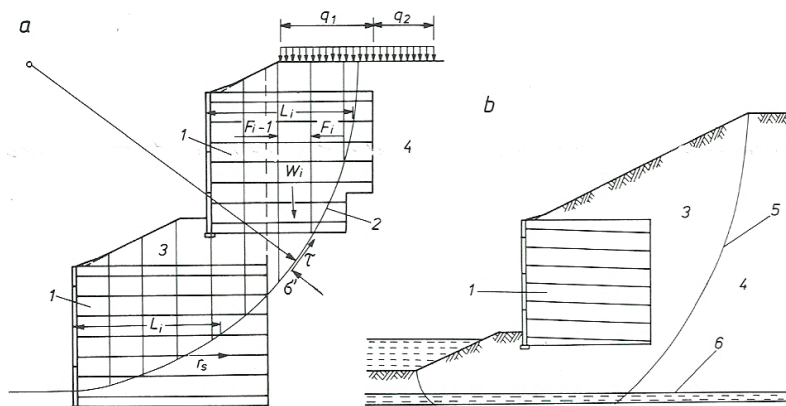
General stability control diagrams: *a* – destruction along the cylindrical surface, *b* – extraordinary massif damage case with a weak layer in the substrate, 1 – reinforced soil massif, 2 – circular line illustrating massif destruction, 3 – destruction zone, 4 – zone outside the destruction area, 5 – line (non-circular) of massif destruction, 6 – weak layer in the substrate
